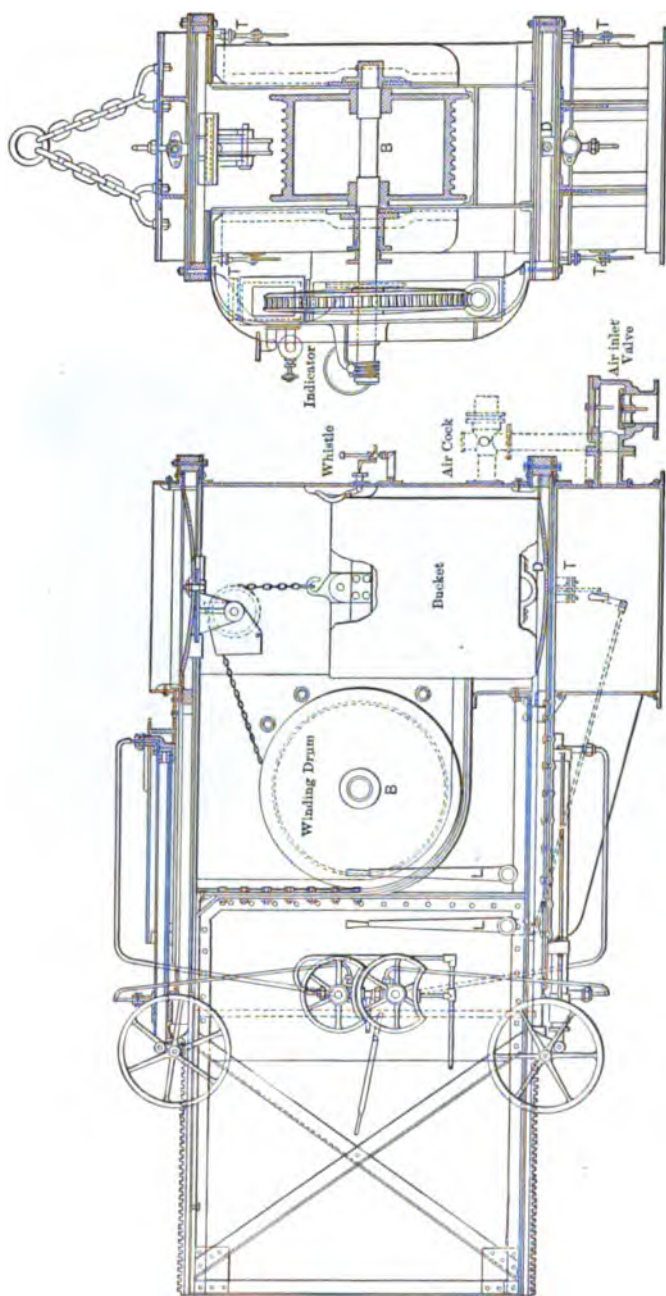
MATERIAL LOCK (SECTIONS), FORTH BRIDGE.
